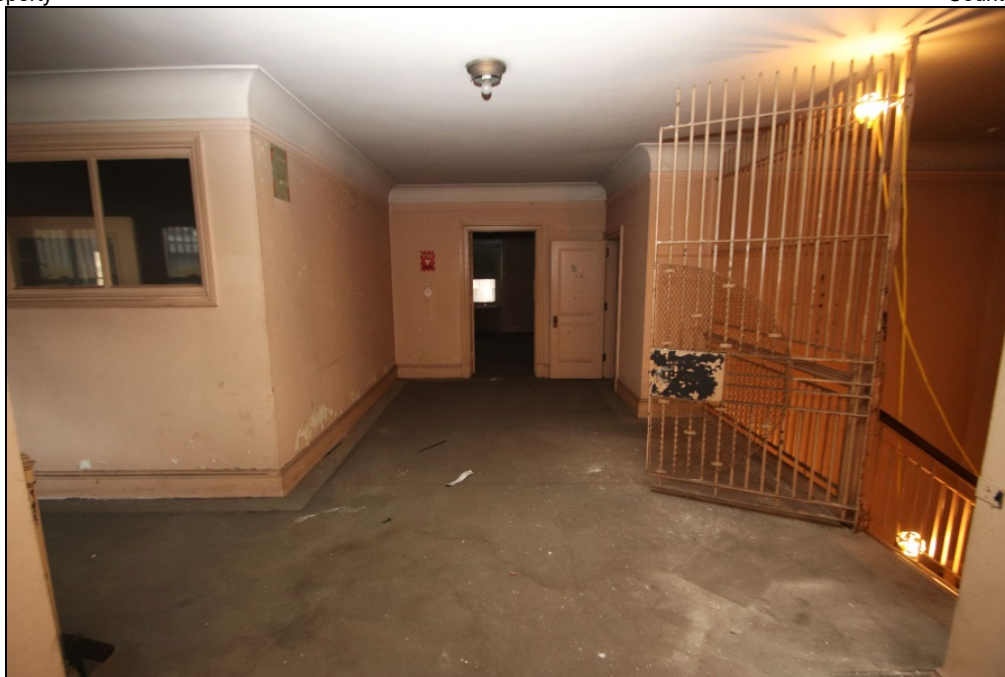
Mezzanine (second floor), east of the banking hall, looking south.
